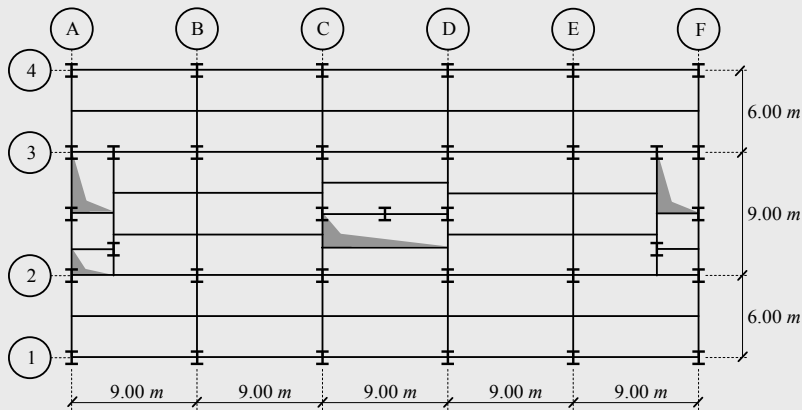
Plan of the 3<sup>rd</sup> to 7<sup>th</sup> floor
